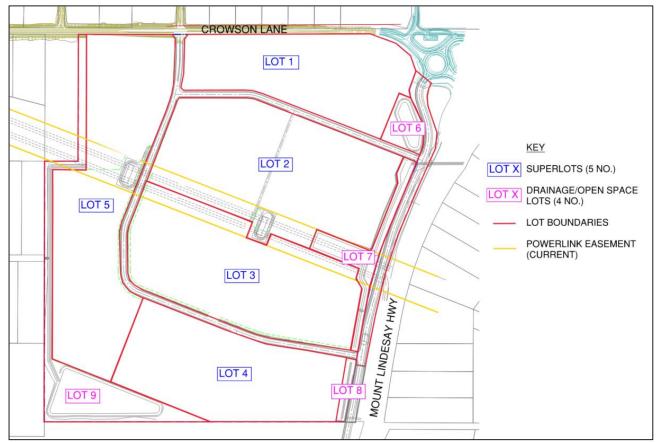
Proposed Development Superlot Plan (Watson Young MP01 P10, March 2022)
